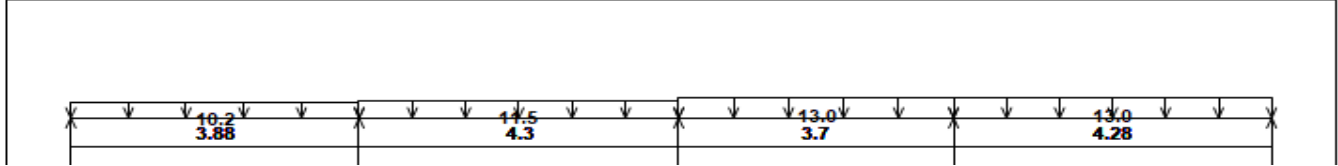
beam 6 for plan basement 1(BB1-2).
